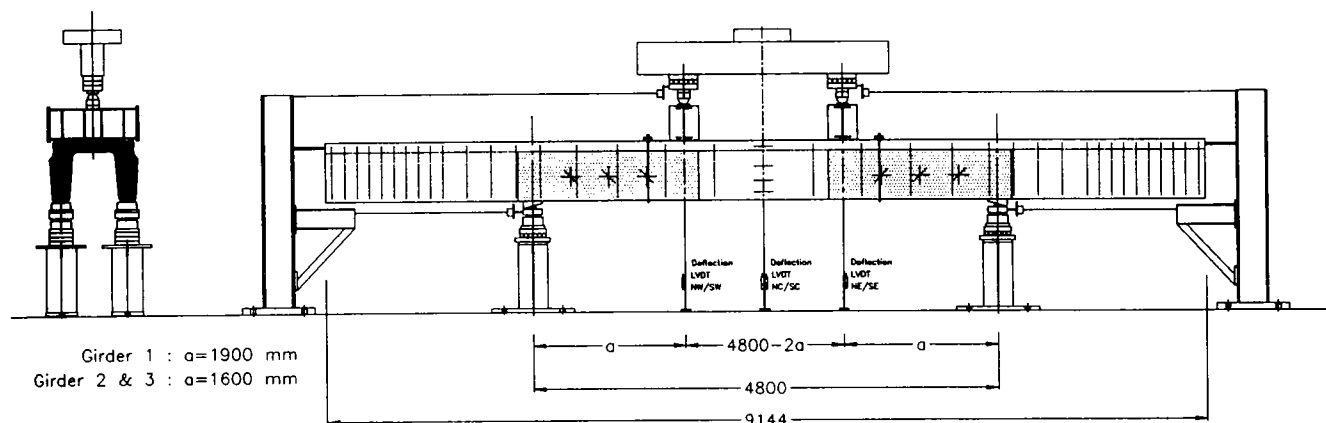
Elevation and cross section of 9.1-m girder in test setup.
